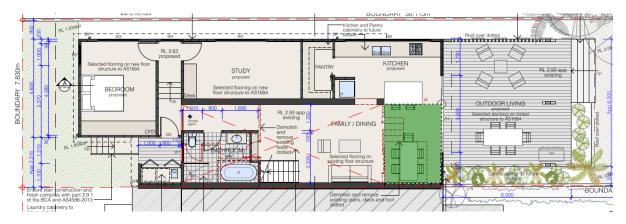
Extract of 'as-built' ground floor plan. Additional floor is highlighted in green.
